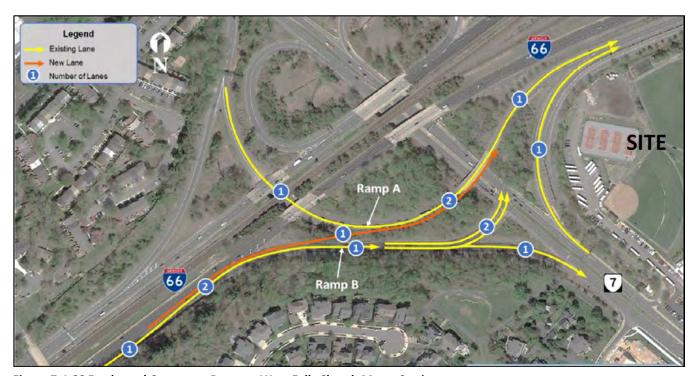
I-66 Eastbound Connector Ramp to West Falls Church Metro Station
